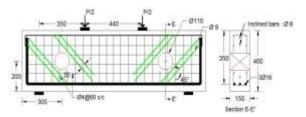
Specimens details and arrangement of reinforcement Note: All dimensions in mm
